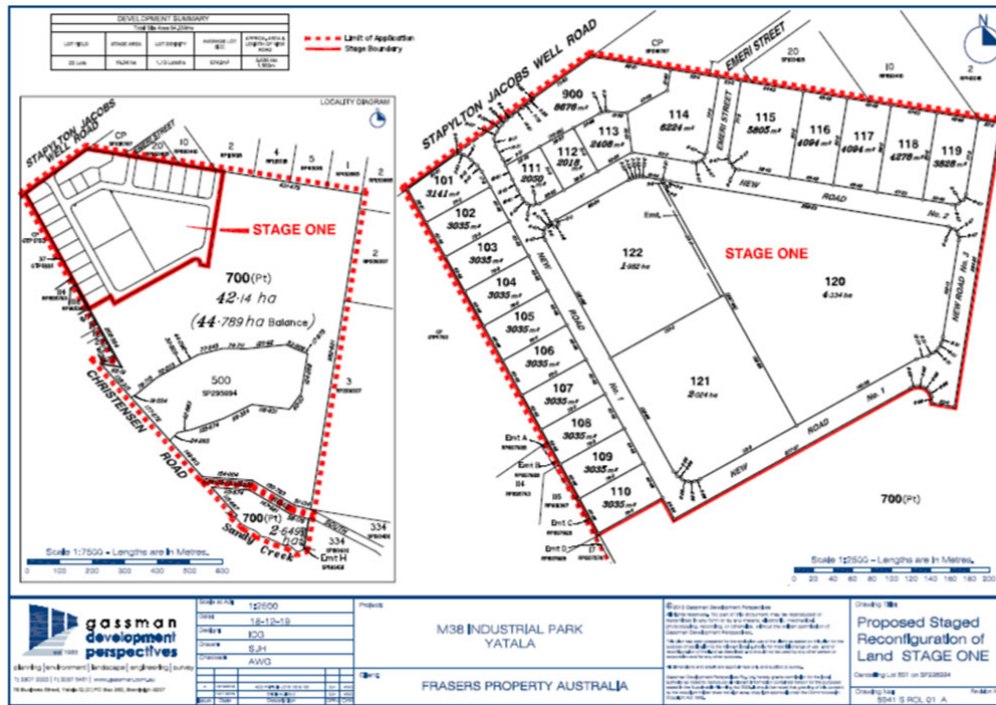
Proposed amended ROL Plan (Source: Gassman Development Perspectives)
